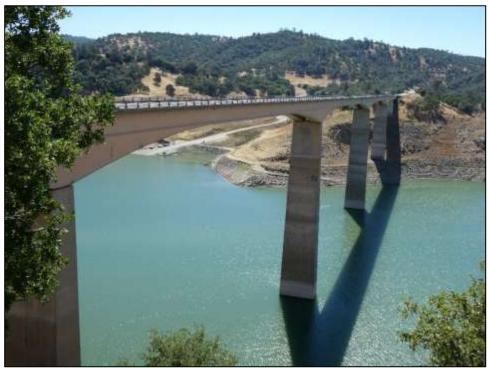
South elevation, camera facing northwest, June 28, 2022.
